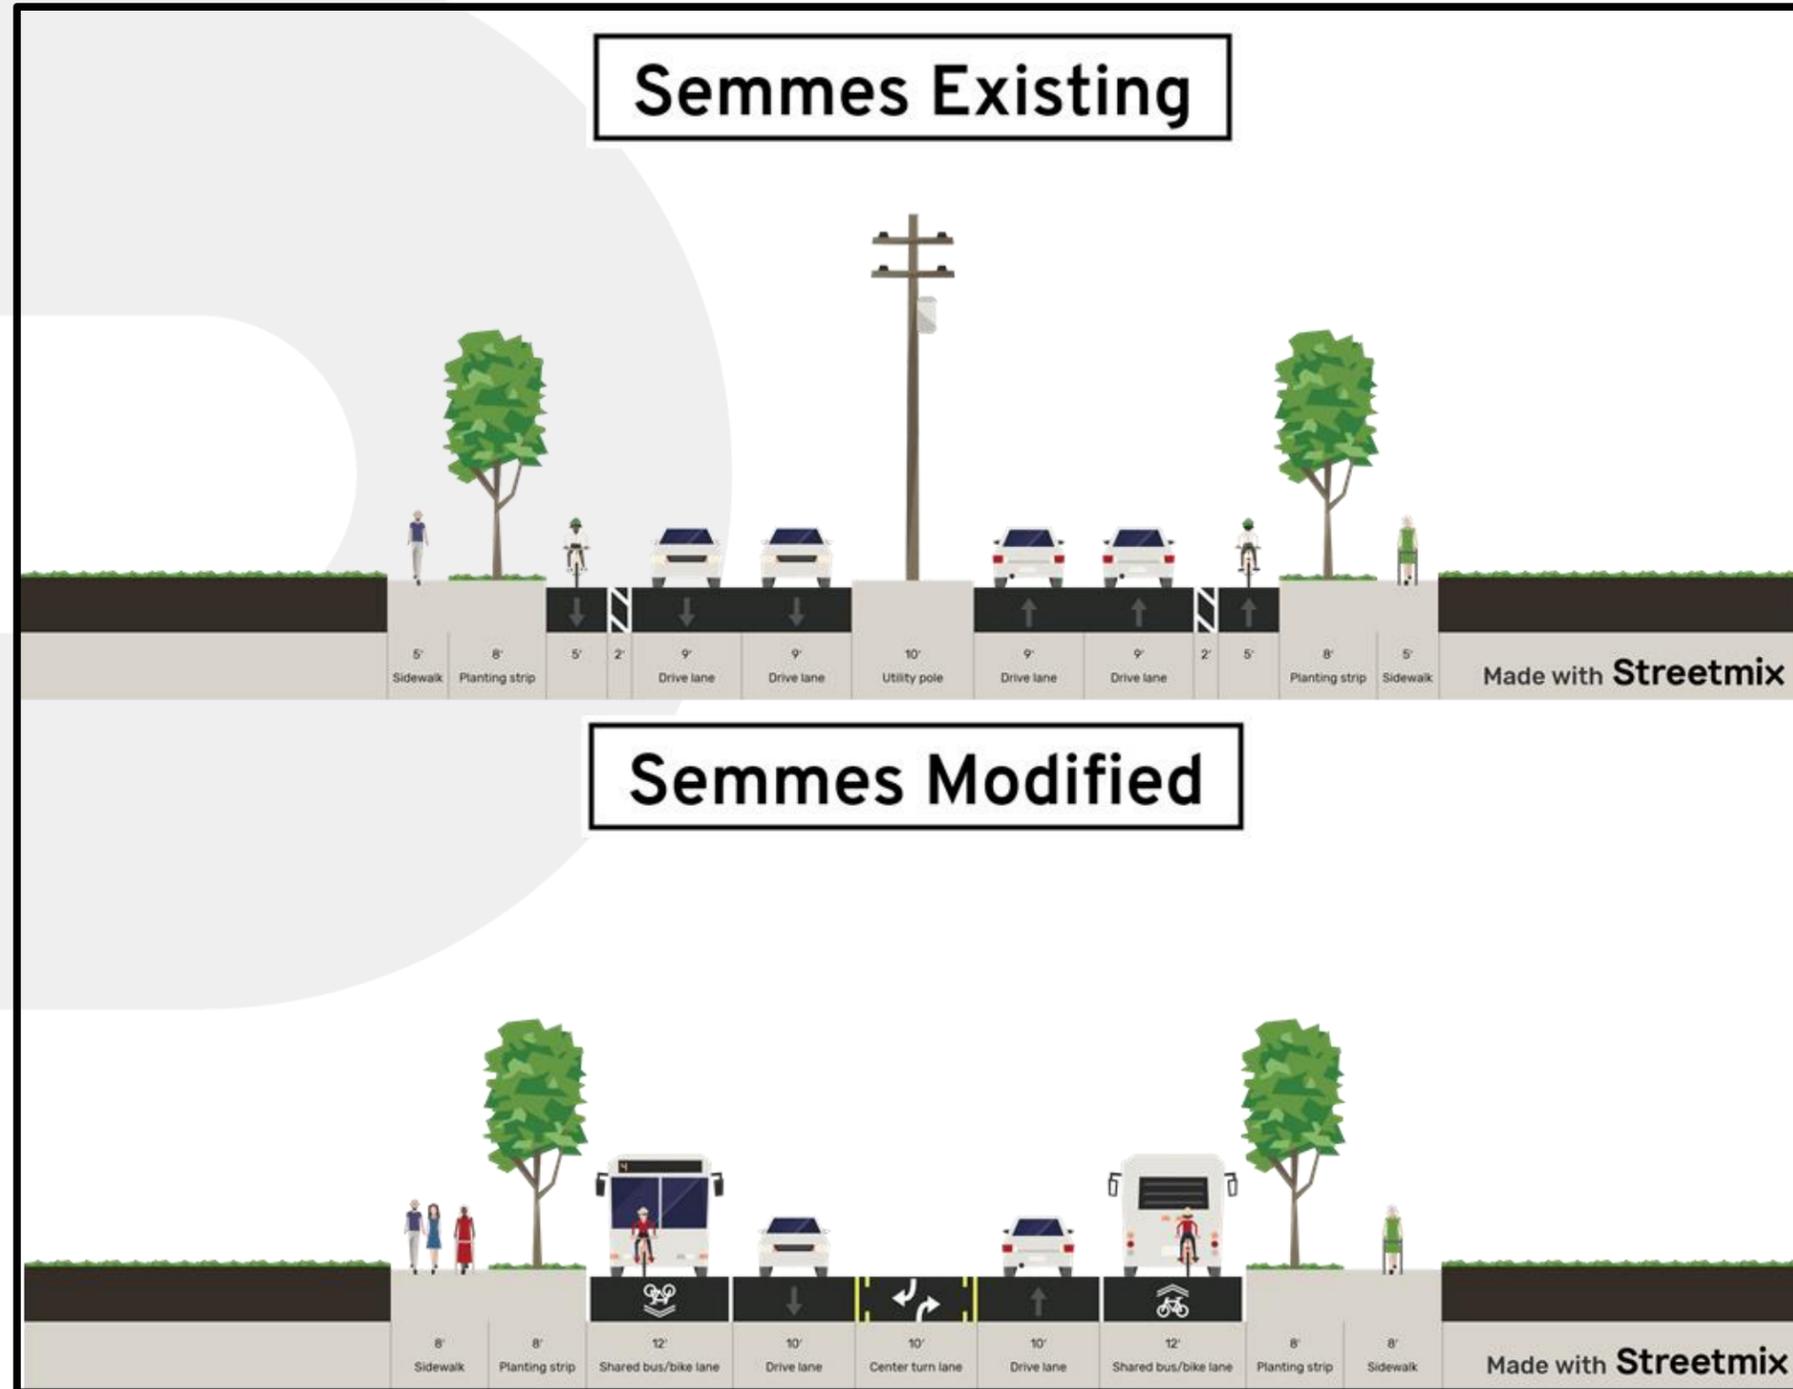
Route 60 (Semmes) – Layout for Concept 4
